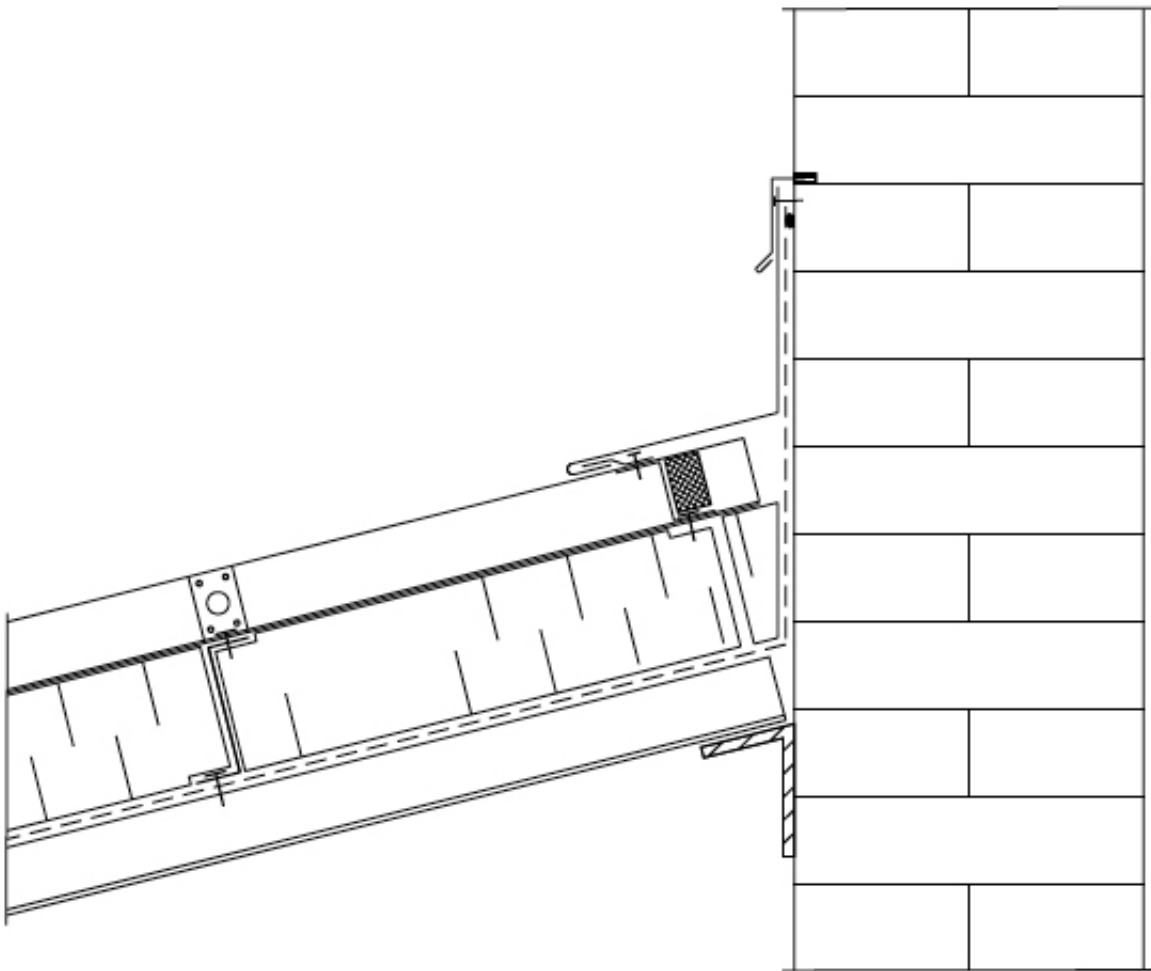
B: Roof to Wall Perpendicular to Sheet - Masonry WallInstallation/Assembly Notes:
